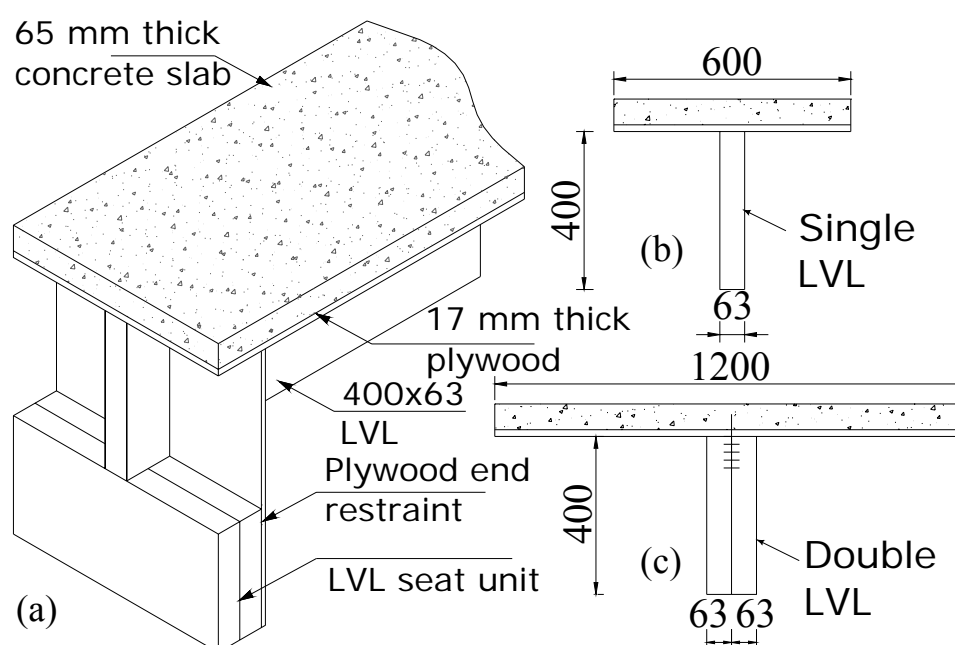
3-D view and cross-sections of beam specimens: (a) beam on LVL seat support; (b) single LVL beam with connection type R; and (c) double LVL beam with connection type P (dimensions in mm)
